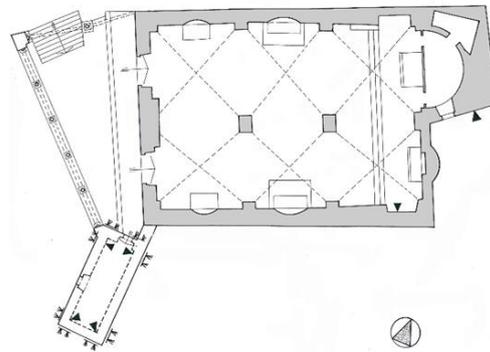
St. Andrew's: plan (Cardani, 2013)
